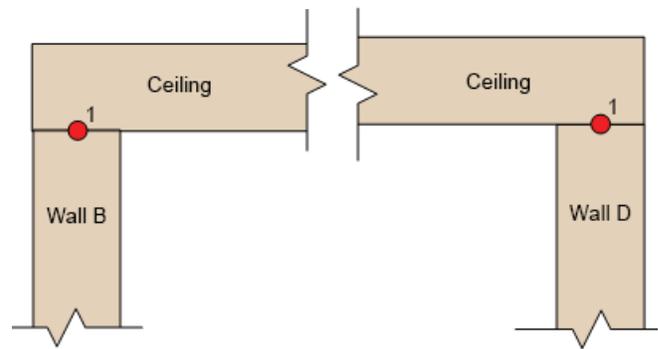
Ceiling–wall joint temperature measurement locations (second floor).
